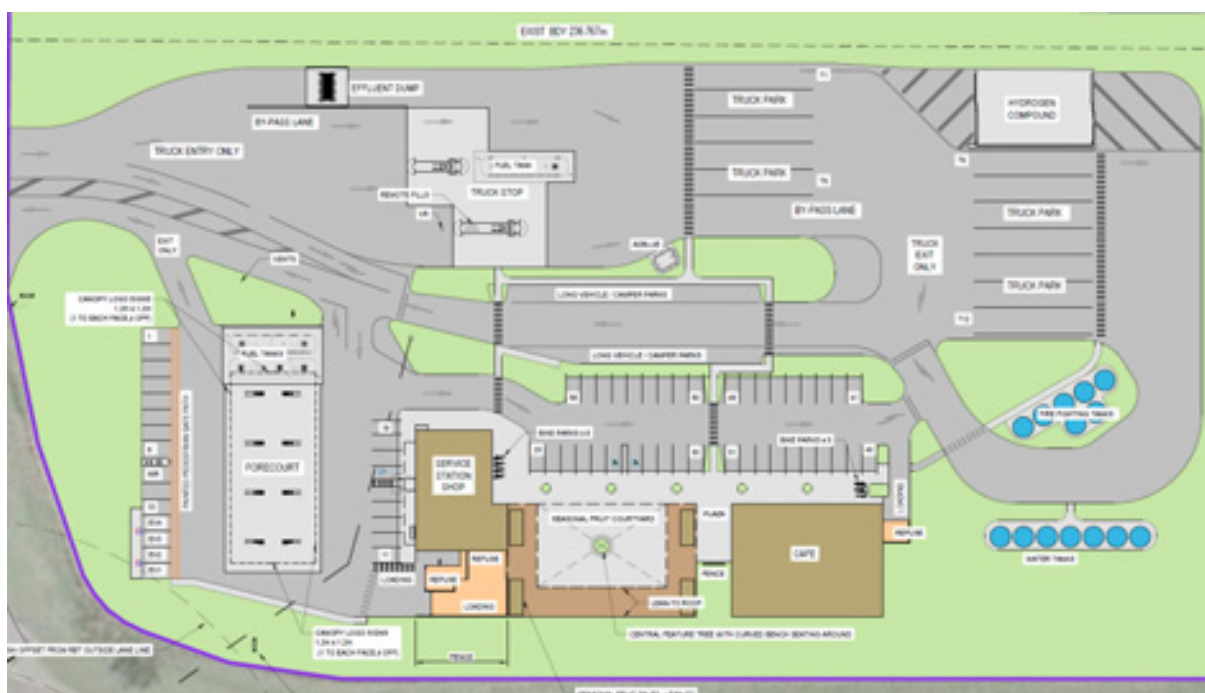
Proposed Site Plan (plans provided by Technitrades Architecture, dated 13.03.2025)
